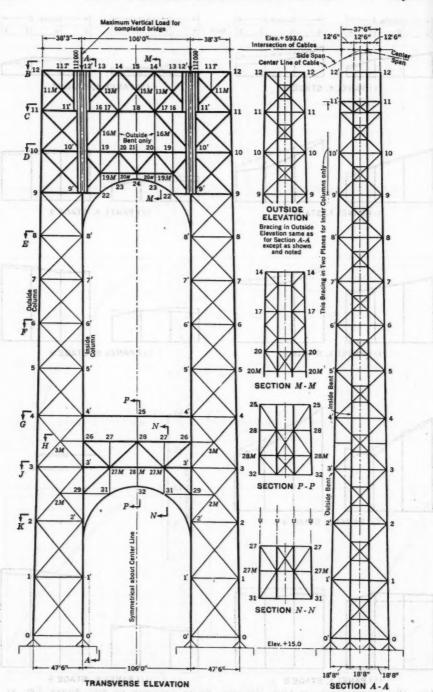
TRANSVERSE AND END ELEVATIONS OF TOWER (SEE, ALSO, FIG. 15).
